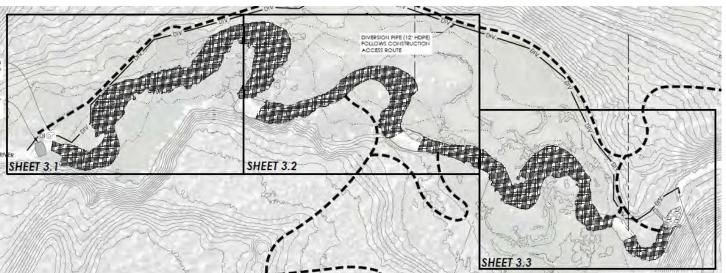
Final Restoration Plan for the Upper Meadow Site - Site 1
